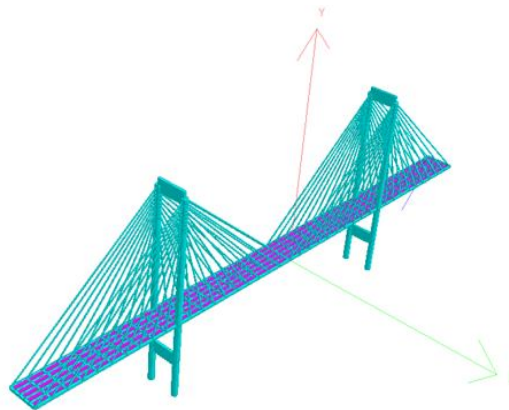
Portal-Shaped Pylon Cable-Stayed Bridge
